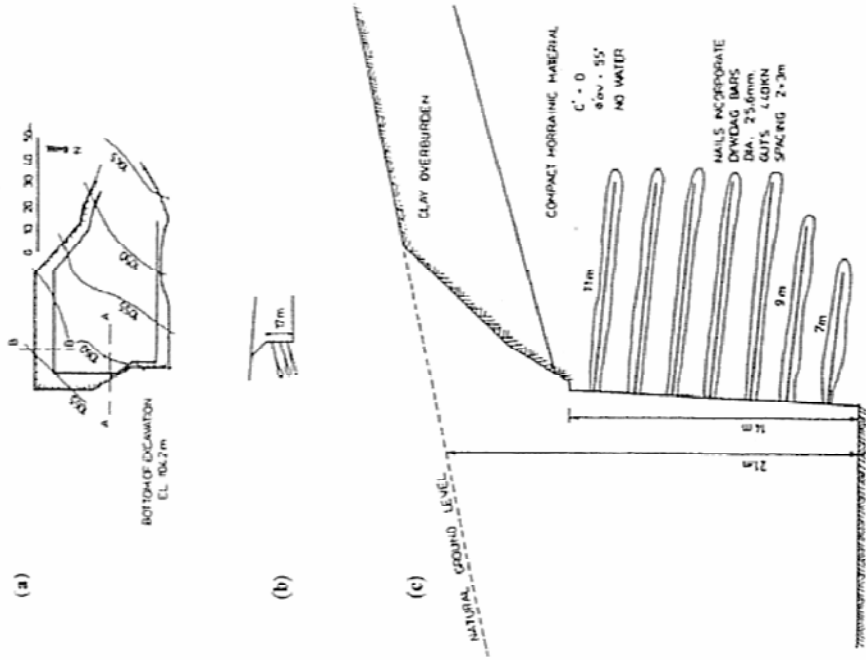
Retaining wall for an underground car park at La Clusaz, France: (a) plan; (b) cross-section A (anchored Berlin wall); (c) cross-section B. After Guillaud *et al.*<sup>37</sup>
